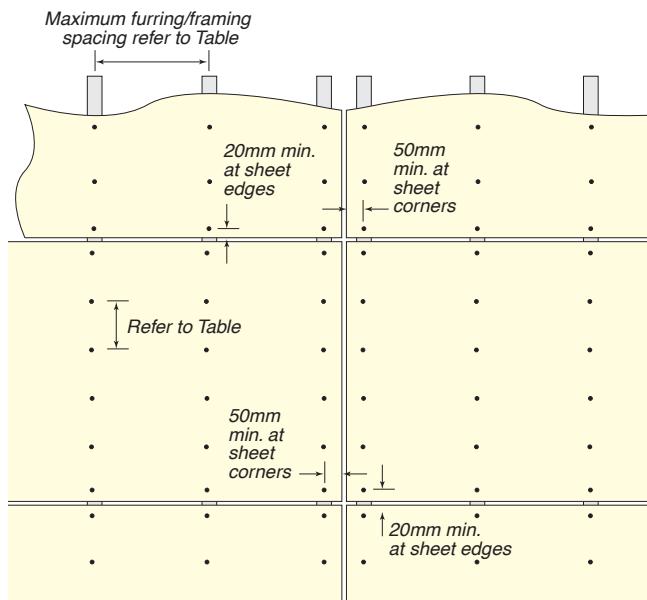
Fastener Fixing System for Exterior Expressed Joint Ceiling Systems
